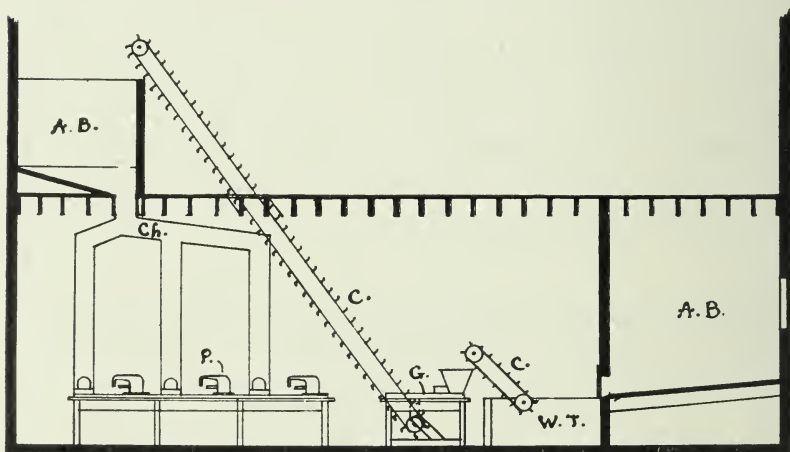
Fig. VIII. Sectional view of evaporator from side, showing belt conveyor from grader to storage bin and chutes from bin to paring table. A.B., apple bin with elevated floor and sliding door delivering into W.T., washing tank. C., conveyor lifting apples from washing tank into hopper of G., grader. C. a second conveyor receiving apples from grader and carrying them to A.B., apple bin on second floor. Ch., chutes from second-floor bin to paring table. P., parers.
